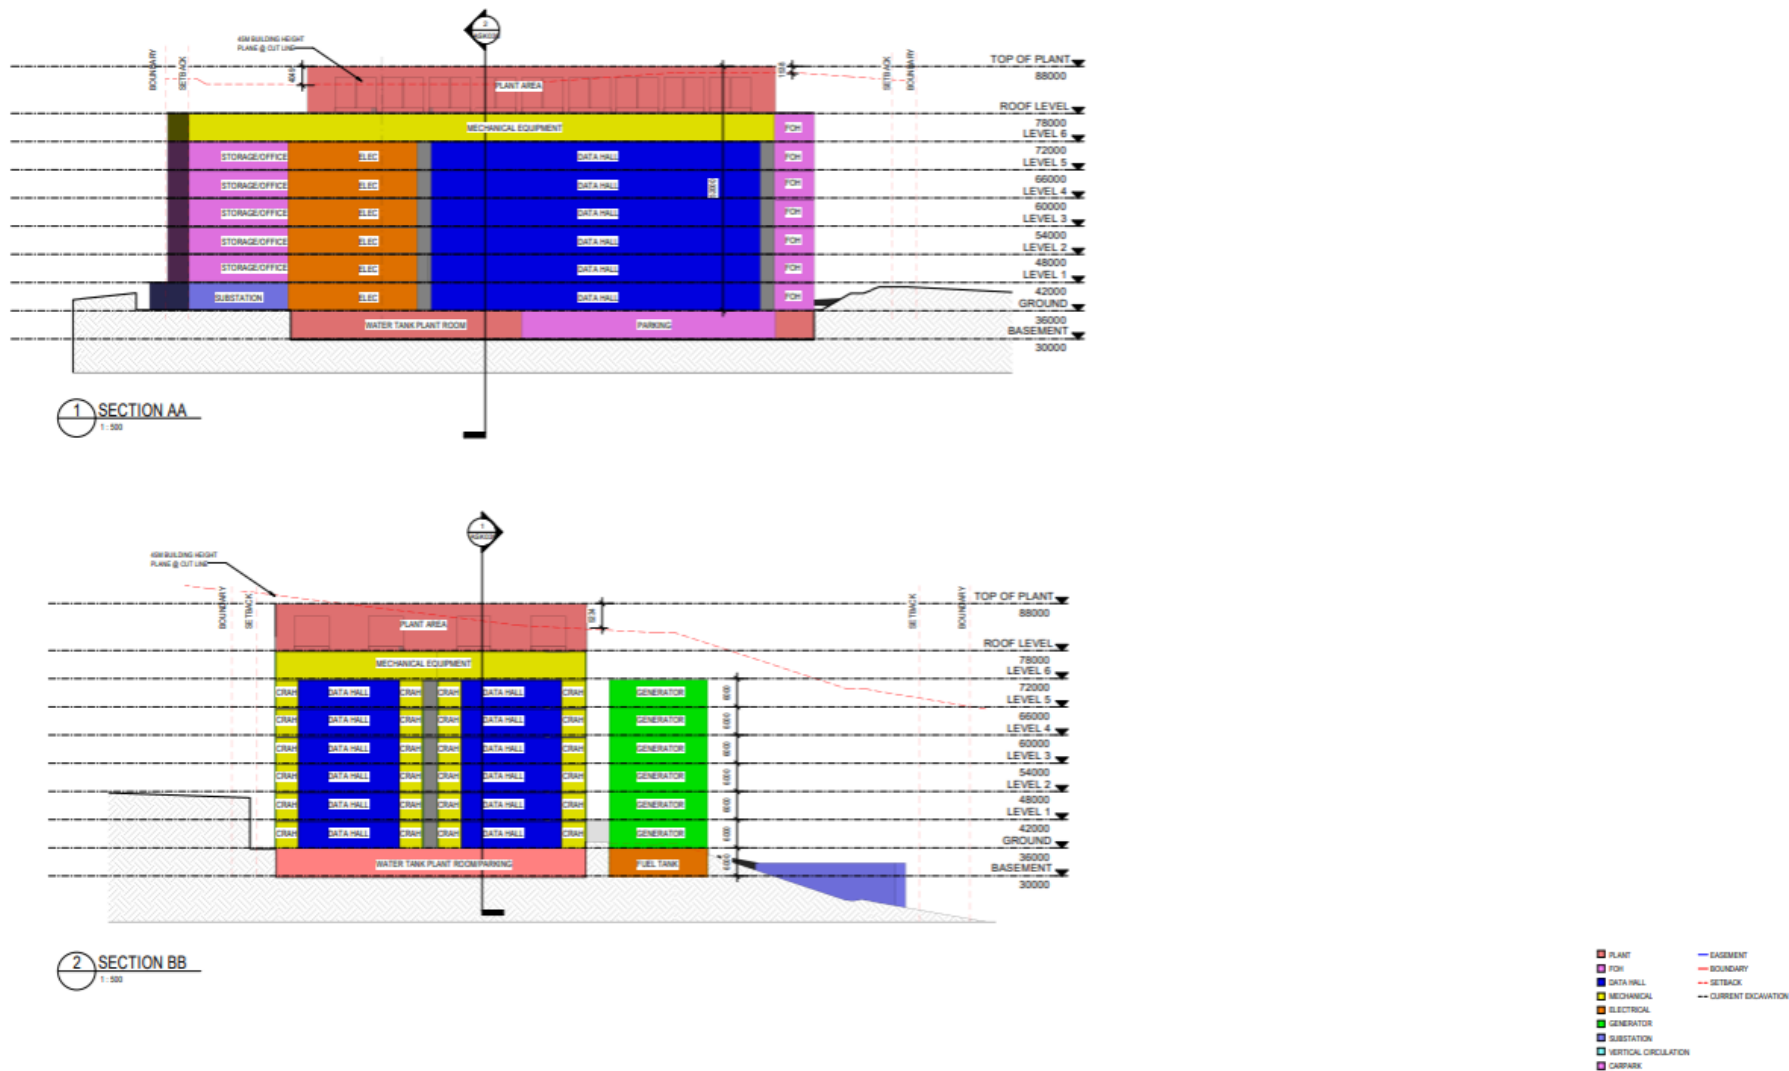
Sections (Source: Greenbox Architecture, 2025)
